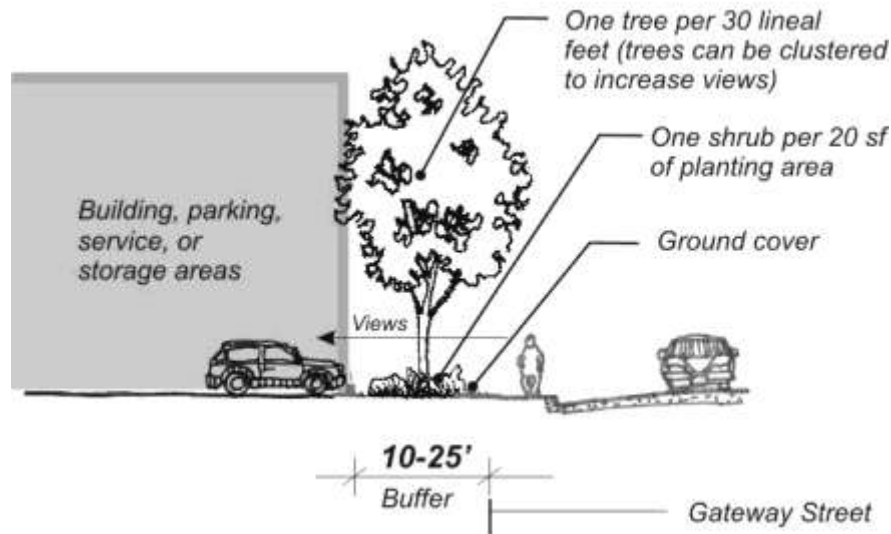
Landscaping standards for planting strips along Gateway Streets.
